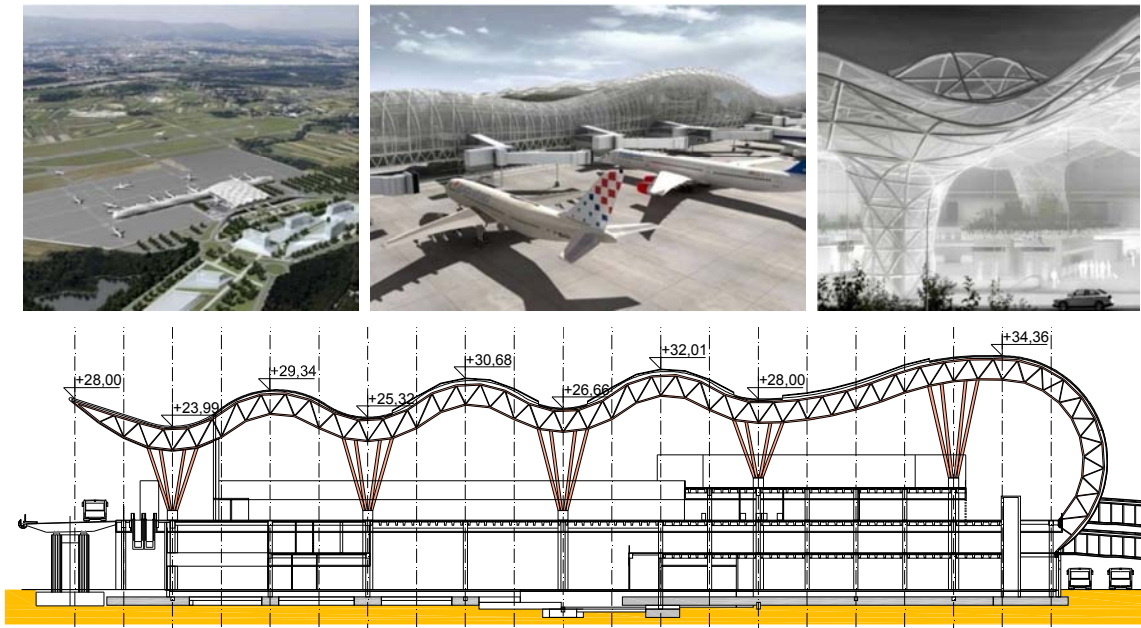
Zagreb Airport passenger terminal: aerial view, airplane stands, part of the roof, one of the building cross-sections transverse to the pier length
